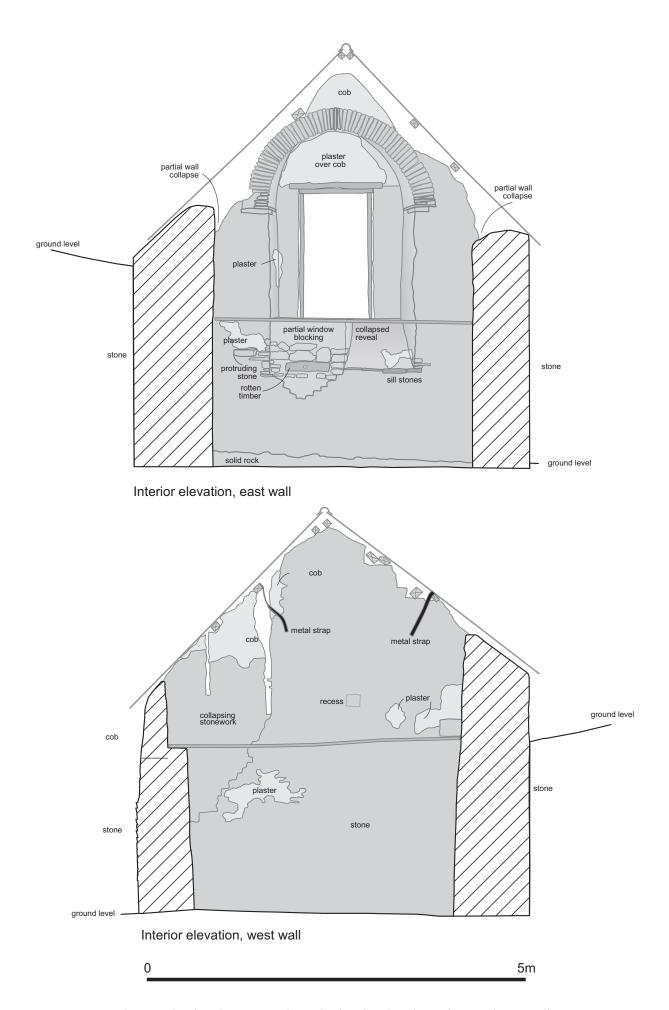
The chapel at Lower Alsworthy, interior elevations of east and west walls (scale 1:50 @A4).
